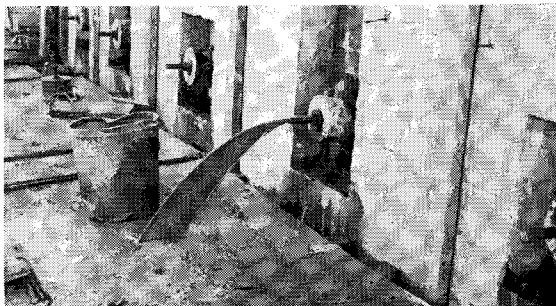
Grout is pumped into the ducts at the far end until it free flows from the vent, which is then capped to build up to specified pressure.
